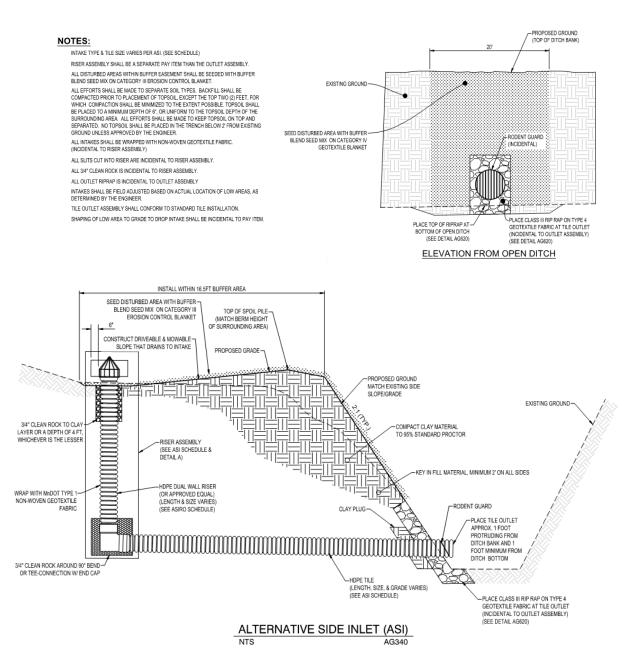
Typical Alternative Side Inlet (ASI) Detail (Not to Scale)
